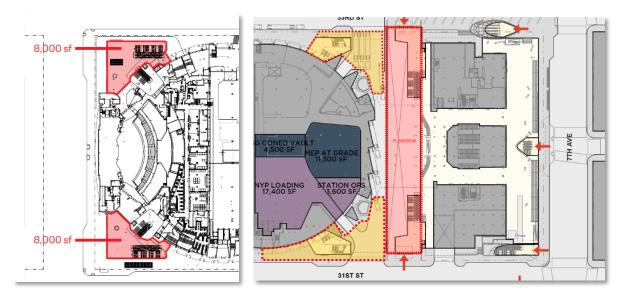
Proposed New Extensions of MSG with Roof Space for HVAC Equipment
